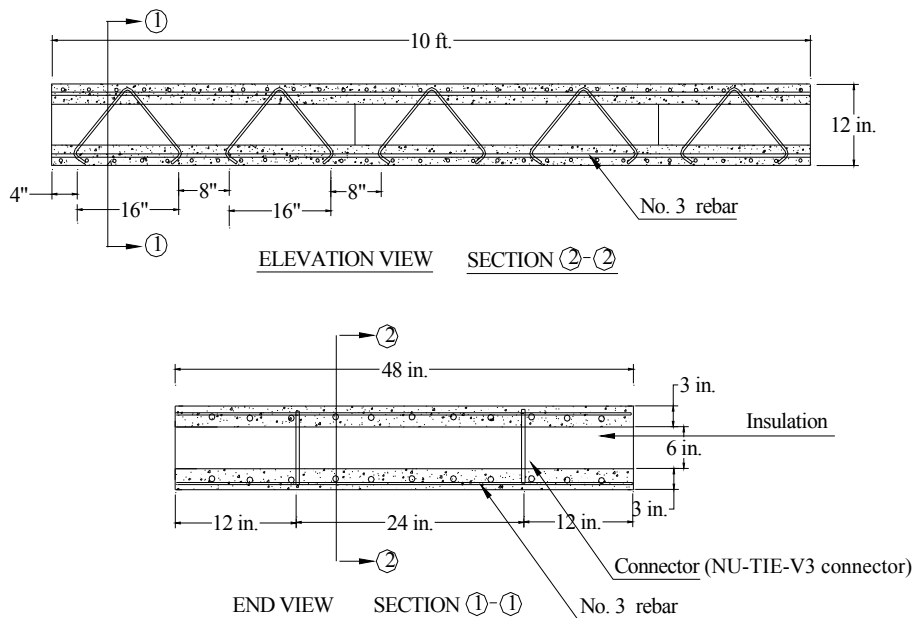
Details of full-scale specimen (using NU-Tie-V3 connectors)
